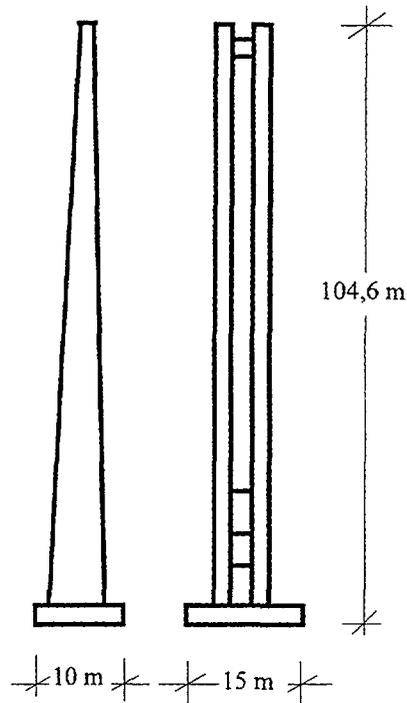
Flexible reinforced concrete structure: Ventilation chimney
